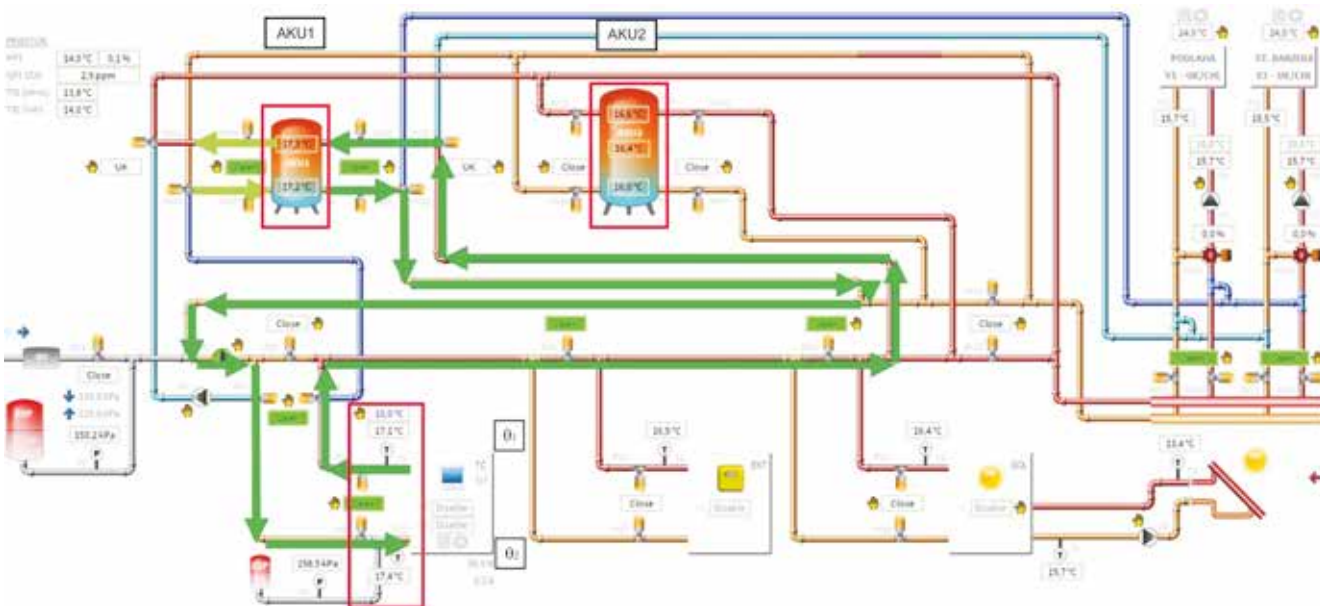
Pipe scheme B with connection of a 100 liter storage tank in the bottom-up filling design [Ing. Matej Kubica]
